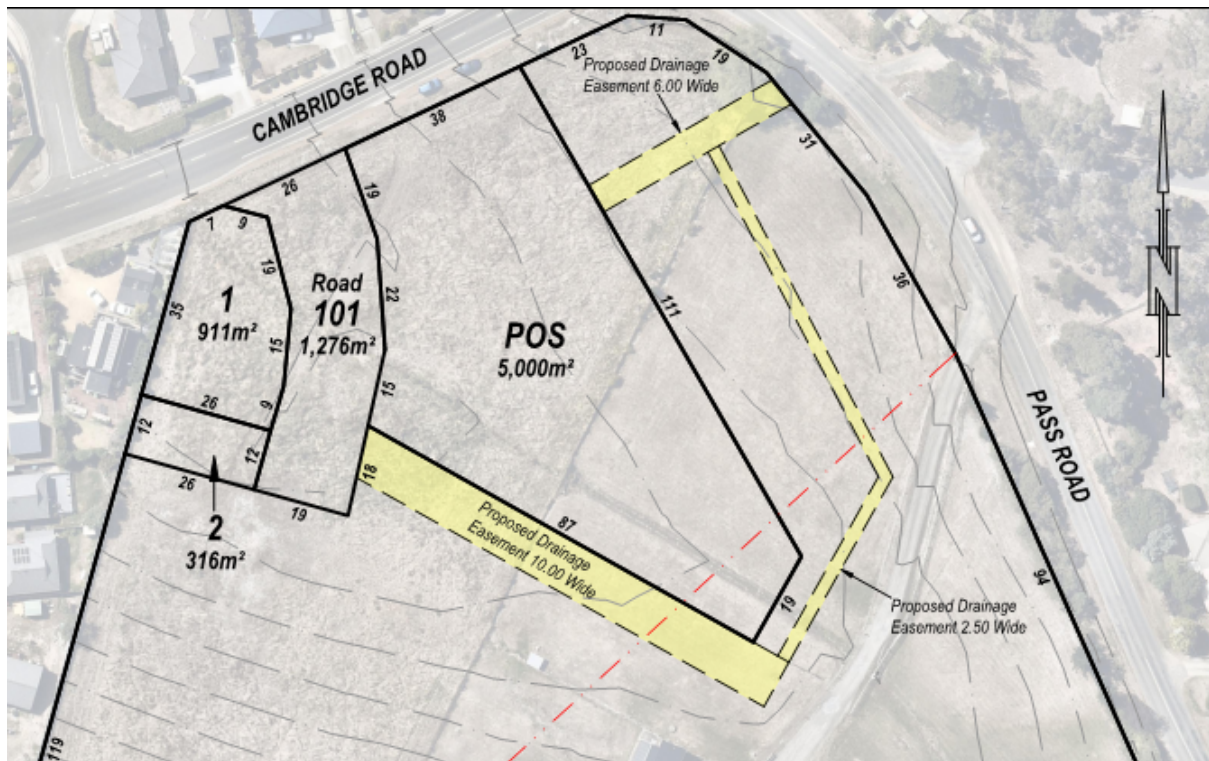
Mornington Point Specific Area Plan - Open Space Provision
